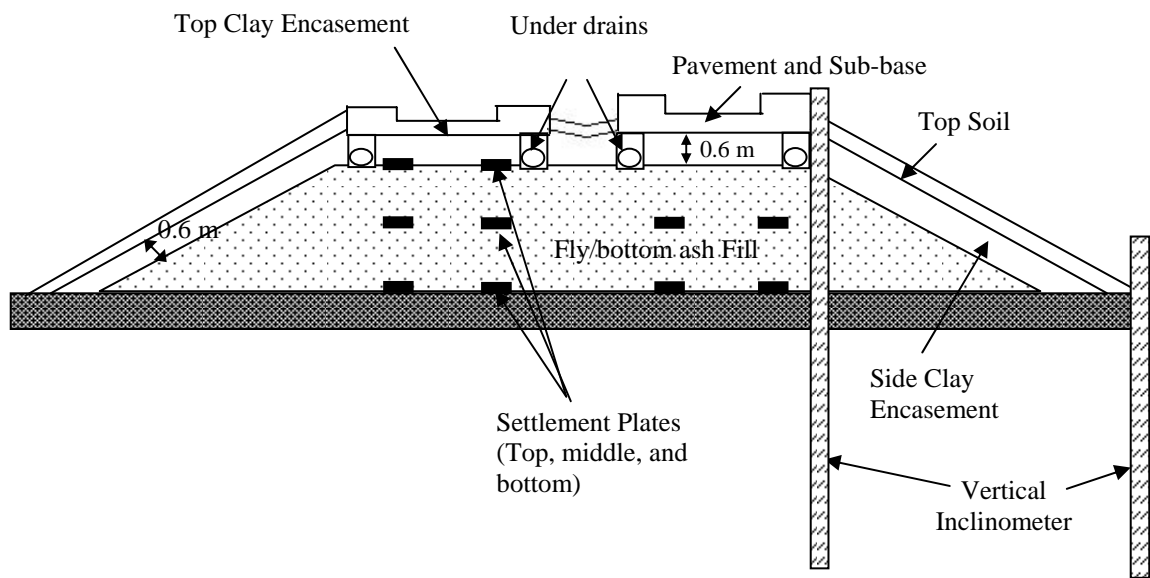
Schematic cross-section of the test embankment at station 6+250.
